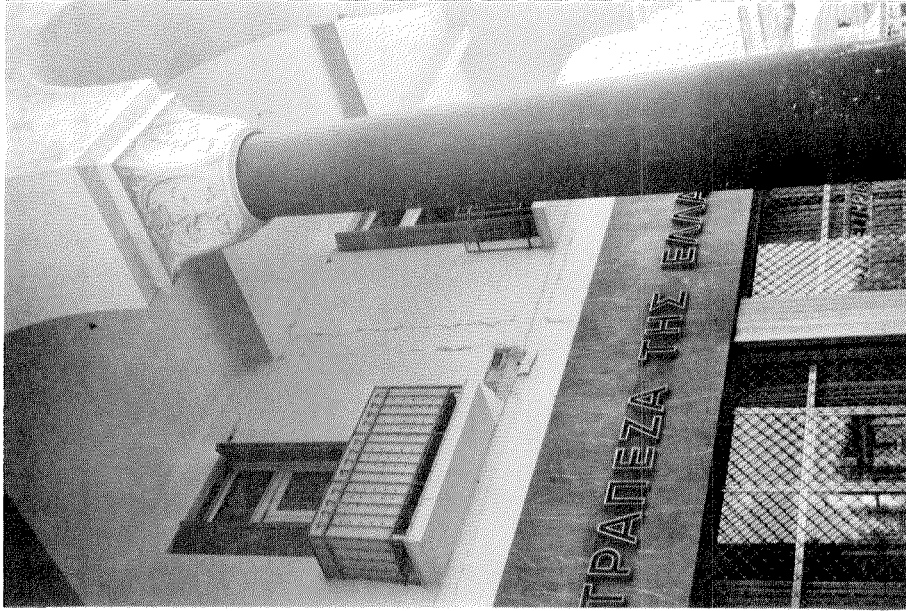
Cracks along the boundary of the concrete frame of a modern building.
